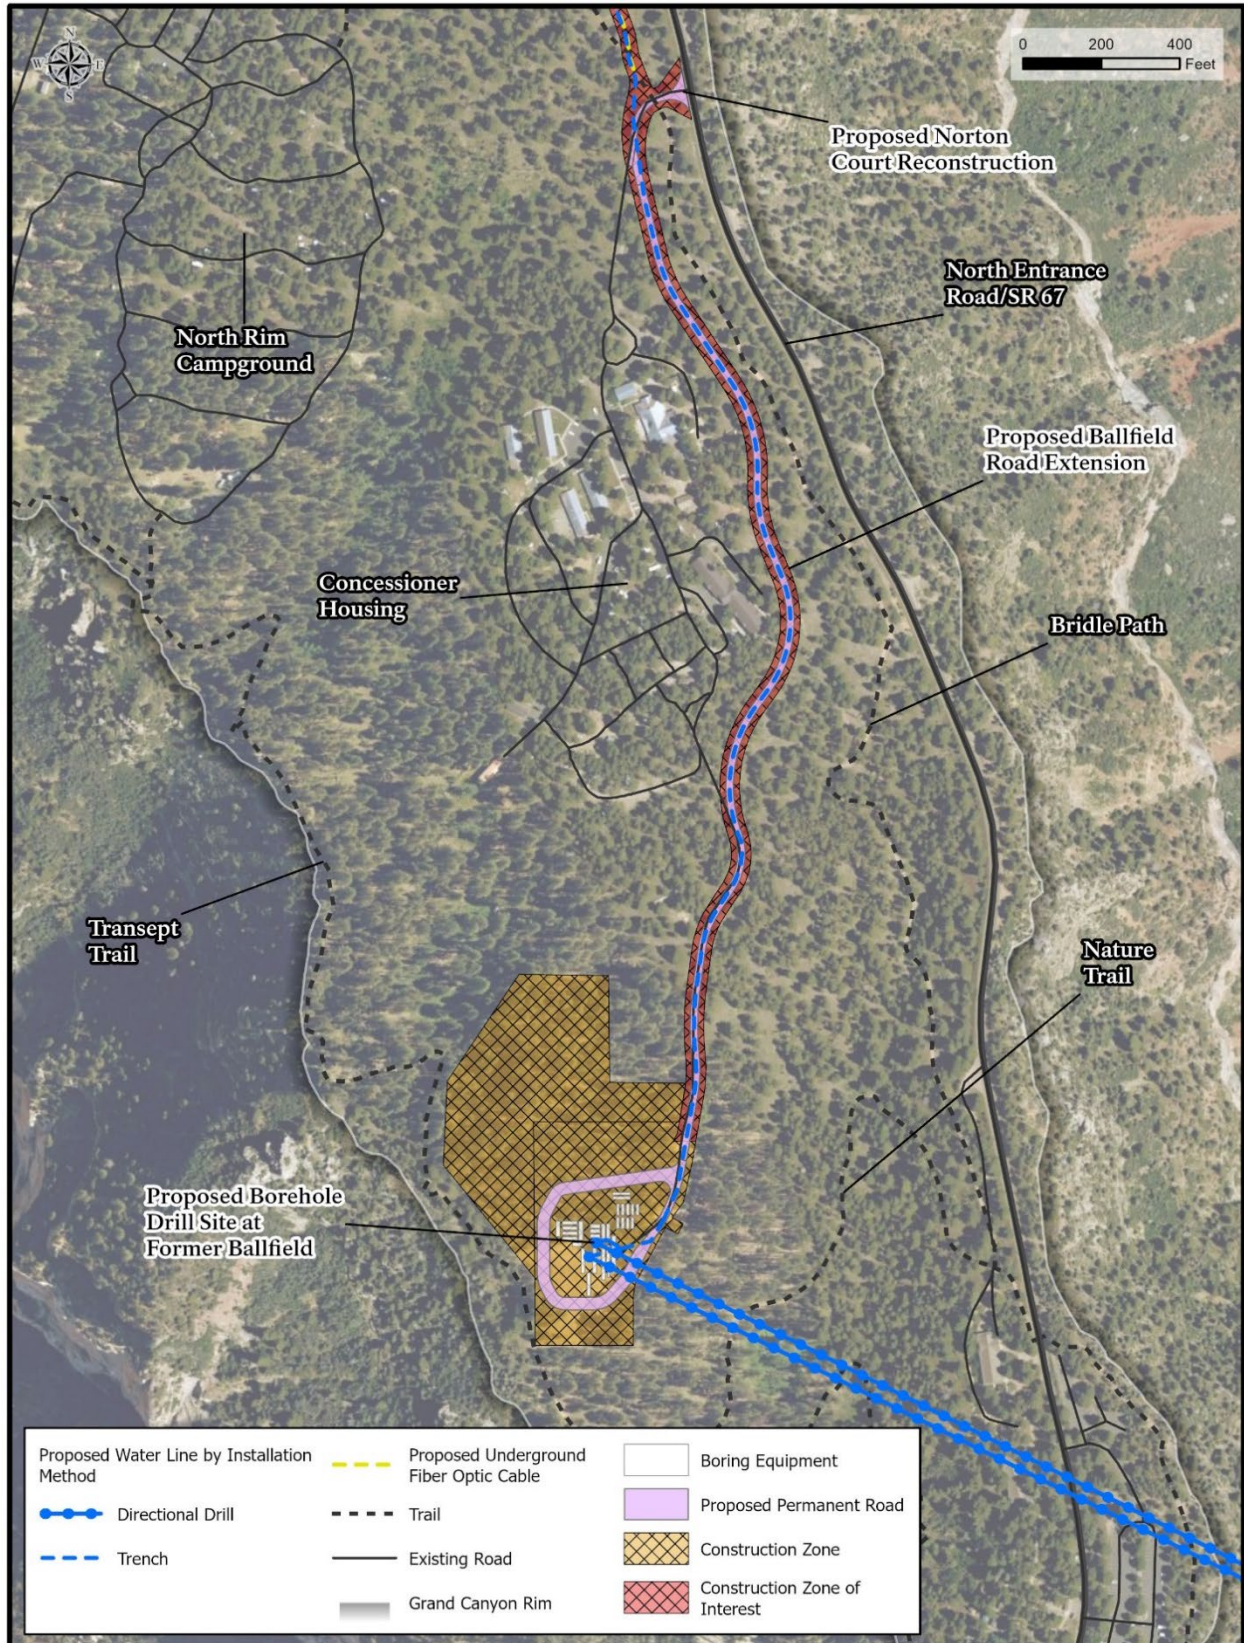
Drill Site Access Road Construction (Ballfield Road Extension) and Norton Court Intersection Reconfiguration
